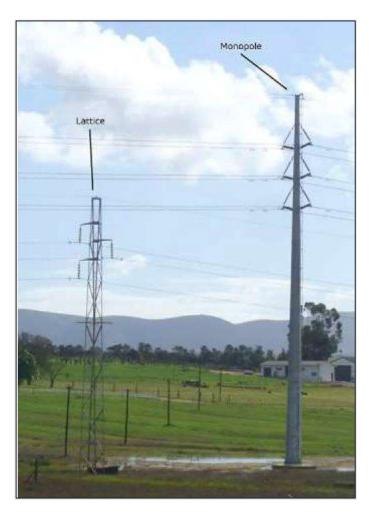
Lattice Powerline Tower and Steel Monopile Structure
